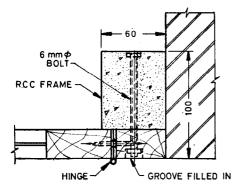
Overall Dimensions of Precast Reinforced Concrete Door Frame
